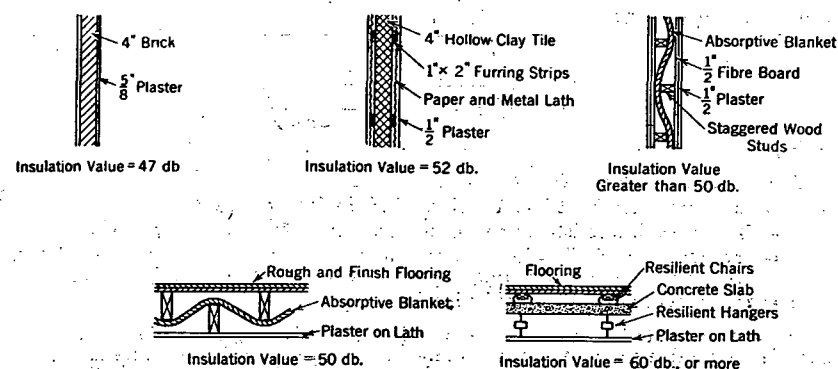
THREE WALL SECTIONS AND TWO FLOOR AND CEILING SECTIONS WHICH ARE SUITABLE FOR THE INSULATION OF EQUIPMENT ROOMS
